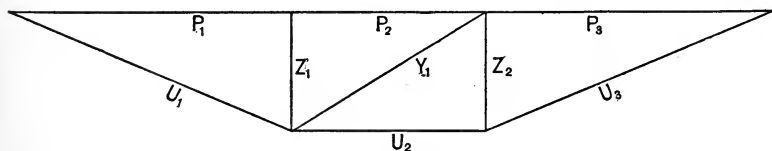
TRUSSED BEAM, THREE LINKS.
